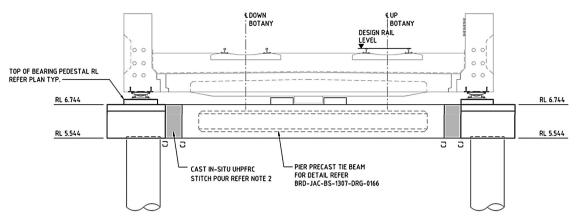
Elevation view of the precast tie beam stitched to the in situ headstocks.
